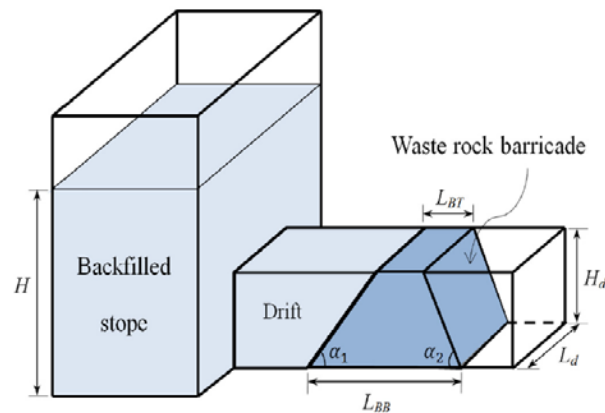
Schematic view of a typical backfilled stope with a trapezoidal barricade (Yang et al. 2017, reprinted with permission of American Society of Civil Engineers)
